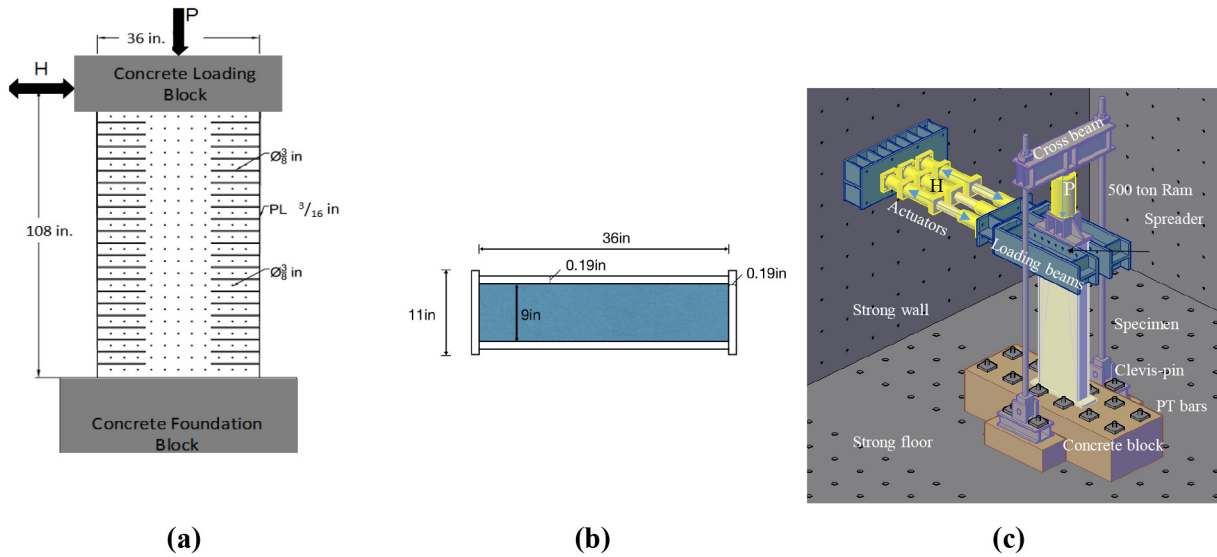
C-PSW/CF walls in (a) elevation view and (b) plan view and (c) total test setup (Note: 1 in. = 25.4 mm).
